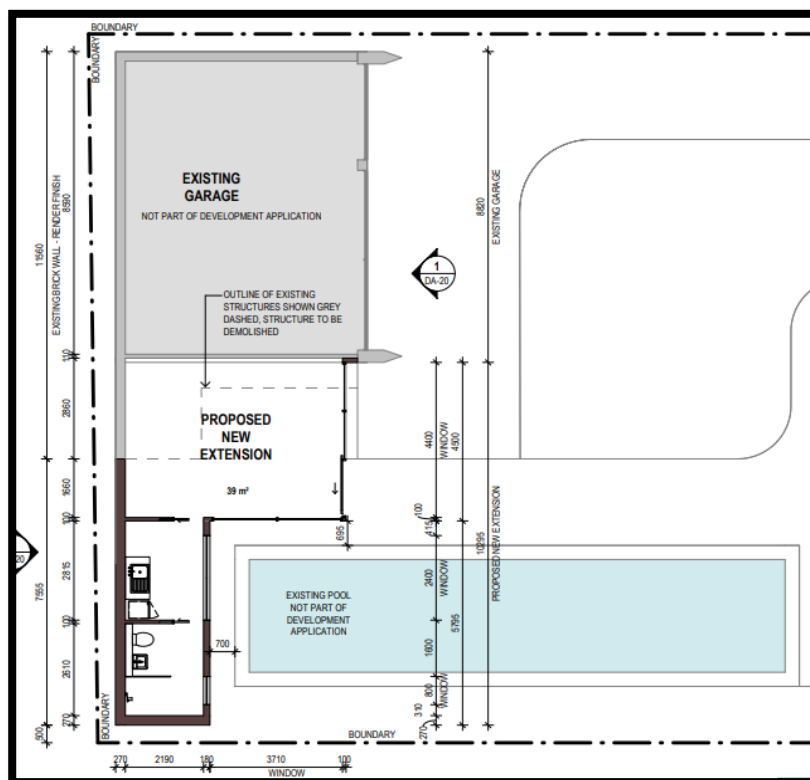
Approved layout of the cabana, external bathroom and storage (DA2019/179).
